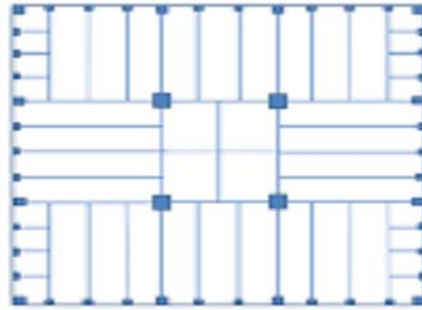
Approximated plan view showing 46 perimeter columns and 4 interior columns.
